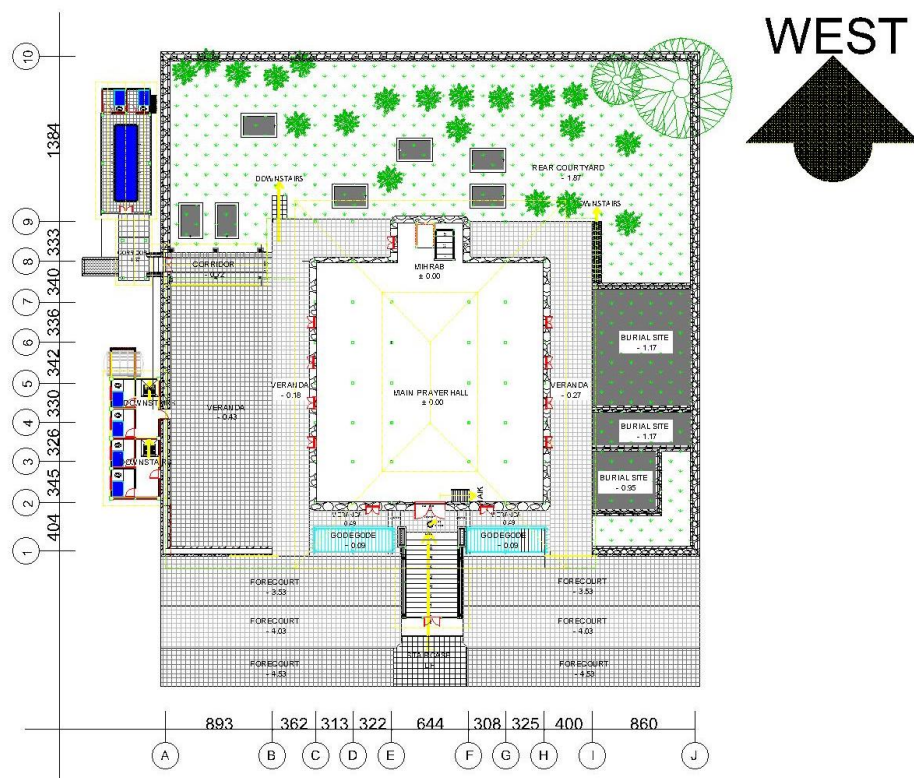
First-Floor Plan of TGMBS (Scale 1:100) (Source: Authors, 2026)
